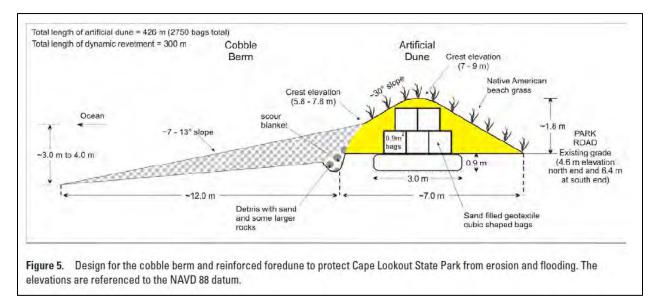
DESIGN CROSS-SECTION OF CAPE LOOKOUT LIVING SHORELINE (ALLAN AND KOMAR, 2004)
